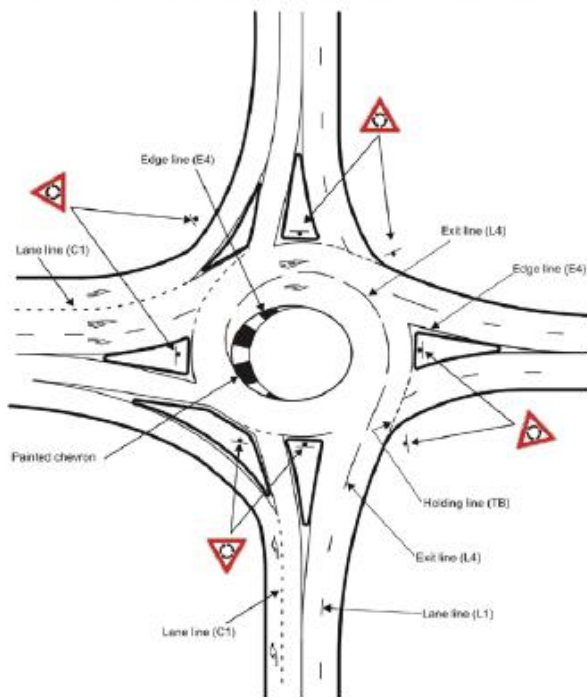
RMS, R141 pavement marking guidelines excerpt.
